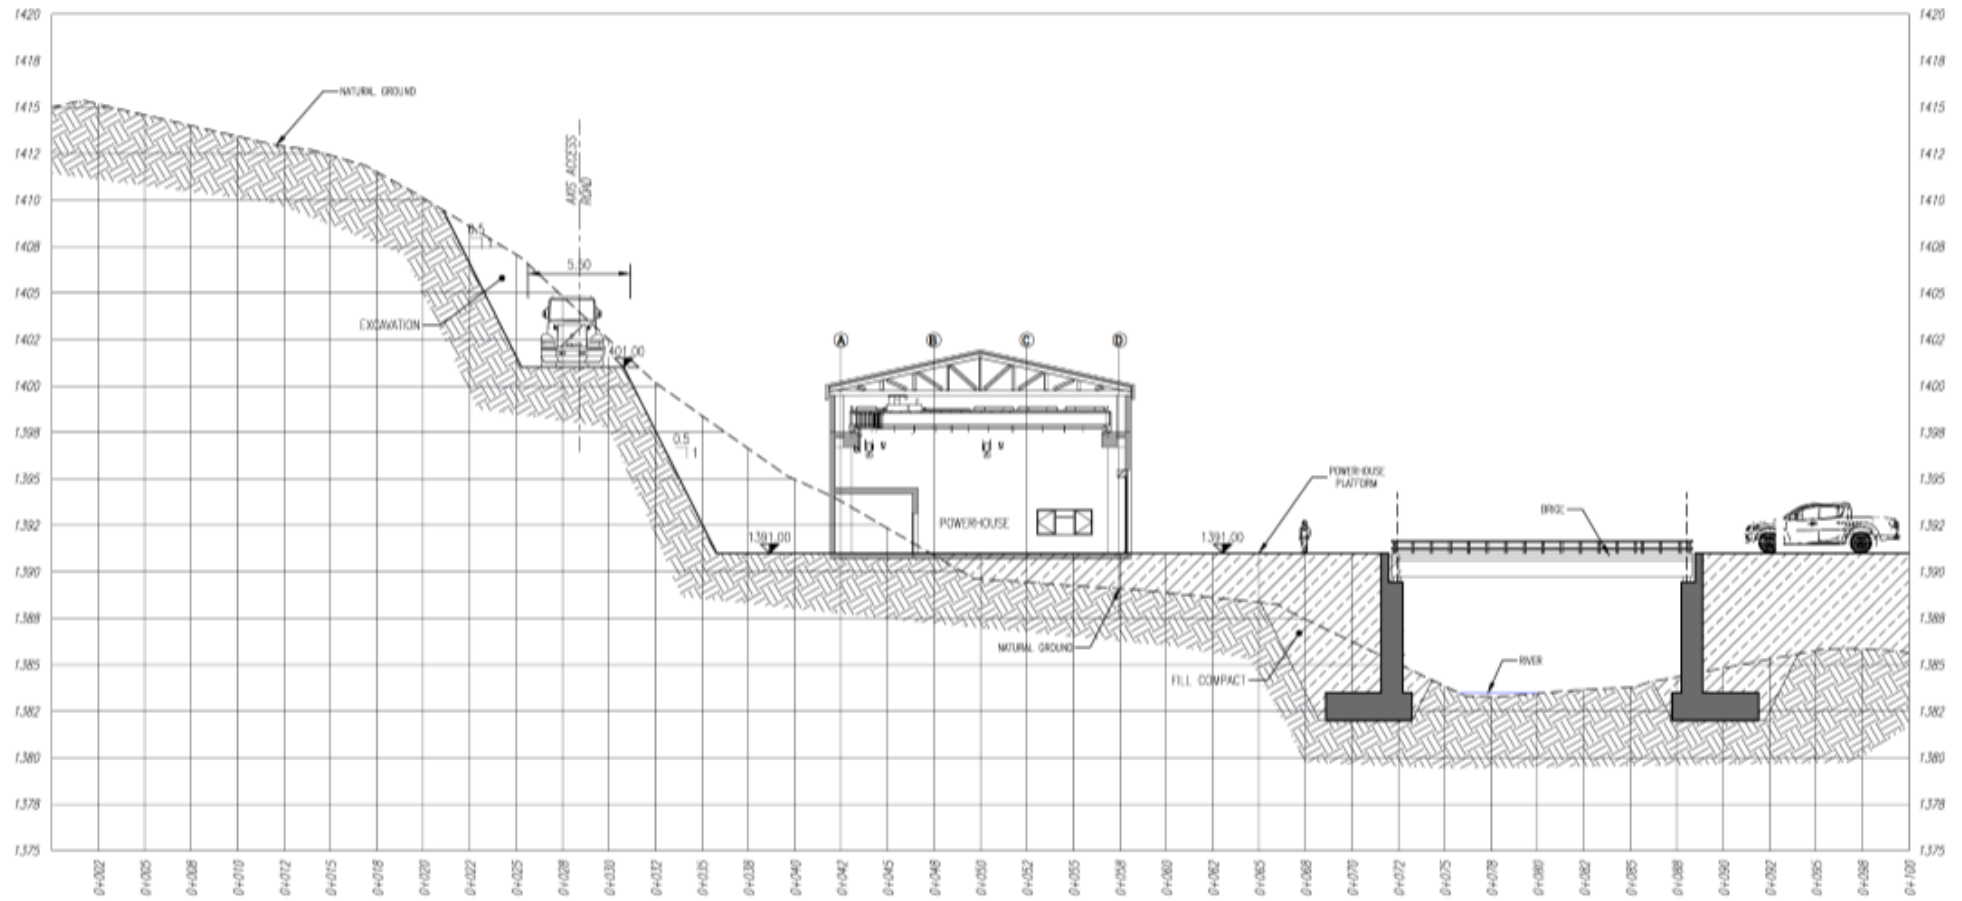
Powerhouse floor at 1391.00 m a.s.l.
